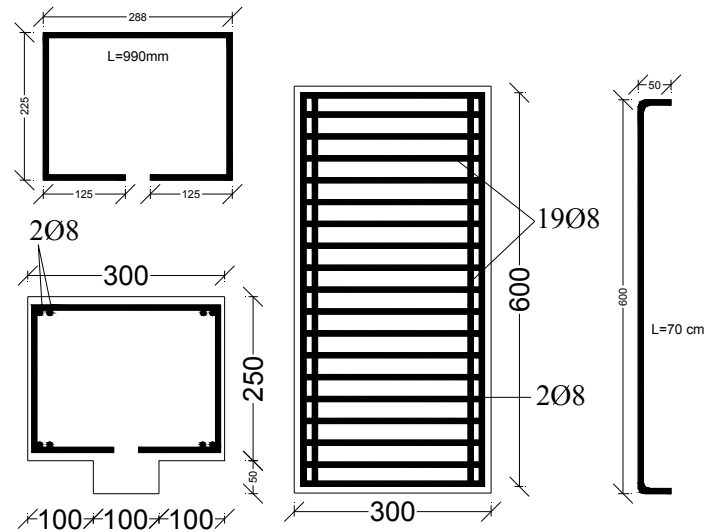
Reinforcement layout and geometry of specimen 2 (Specimen code 3.2 - loading at 1/4 of the length)
